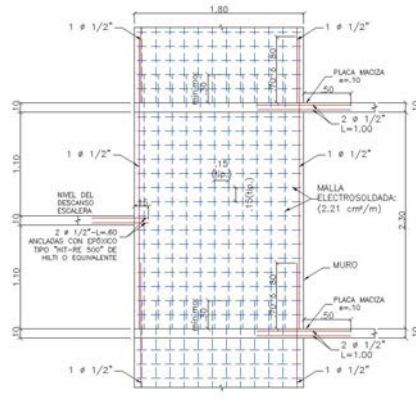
Typical reinforcement of a shear wall (elevation). Seven story project. Photo courtesy of Alvaro P
